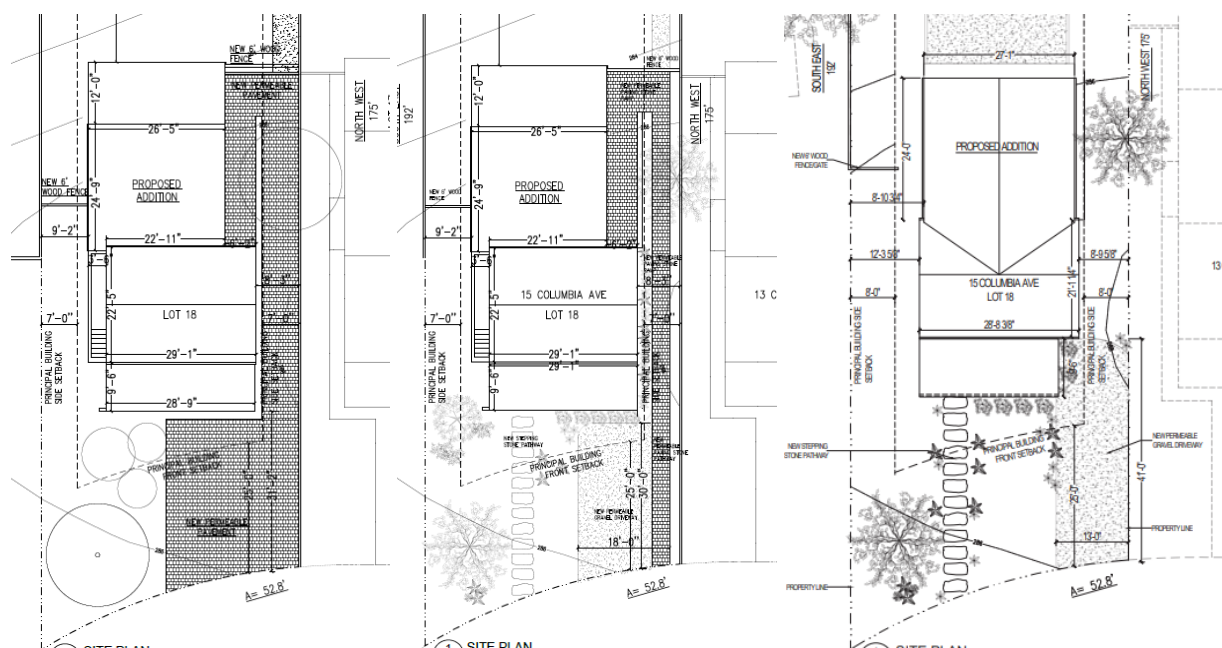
Site plans for additions and alterations at 15 Columbia Avenue, from left to right: preliminary consultation site plan (6/9/2021), first HAWP application (7/14/2021), revised/approved HAWP application (10/26/2022).
